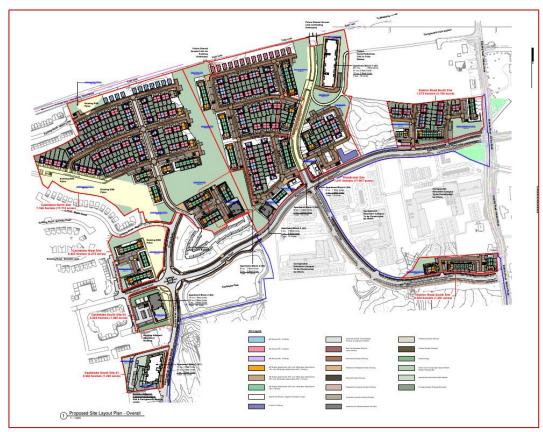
PLAN OF PROPOSED DEVELOPMENT
